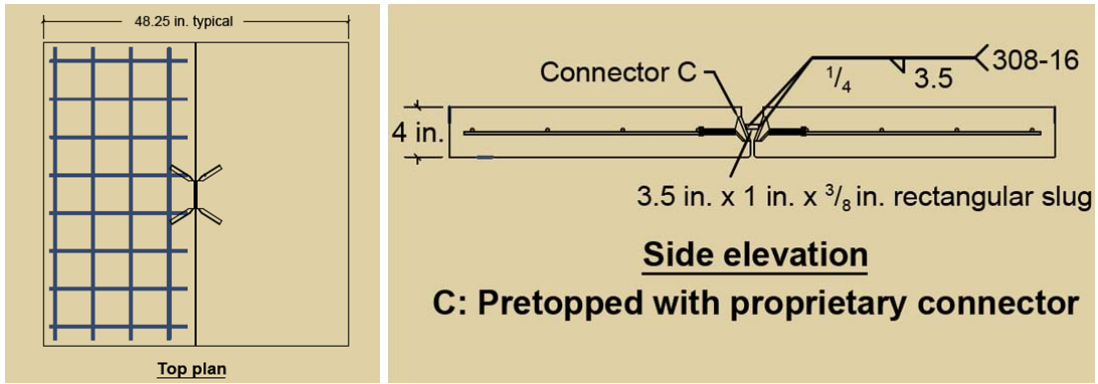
third type of connection tested by Naito and Cao (steel plate embedded in each slabs and rectangular slug)
